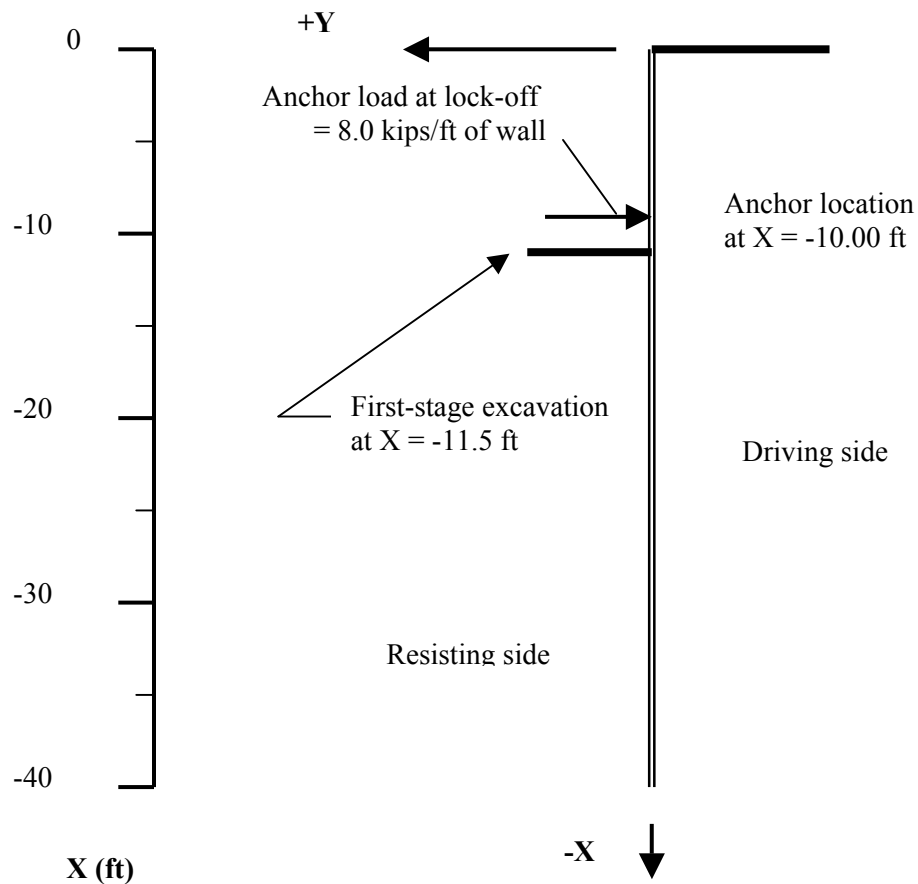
Intermediate construction stage—(first-stage excavation with anchor lock-off load), coordinate system per CMULTIANC
